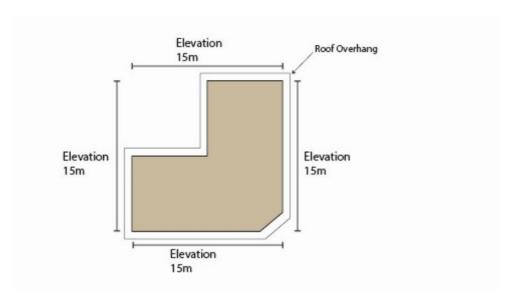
Measurement of a building elevation (Accommodation and Community Facilities Overlay)
